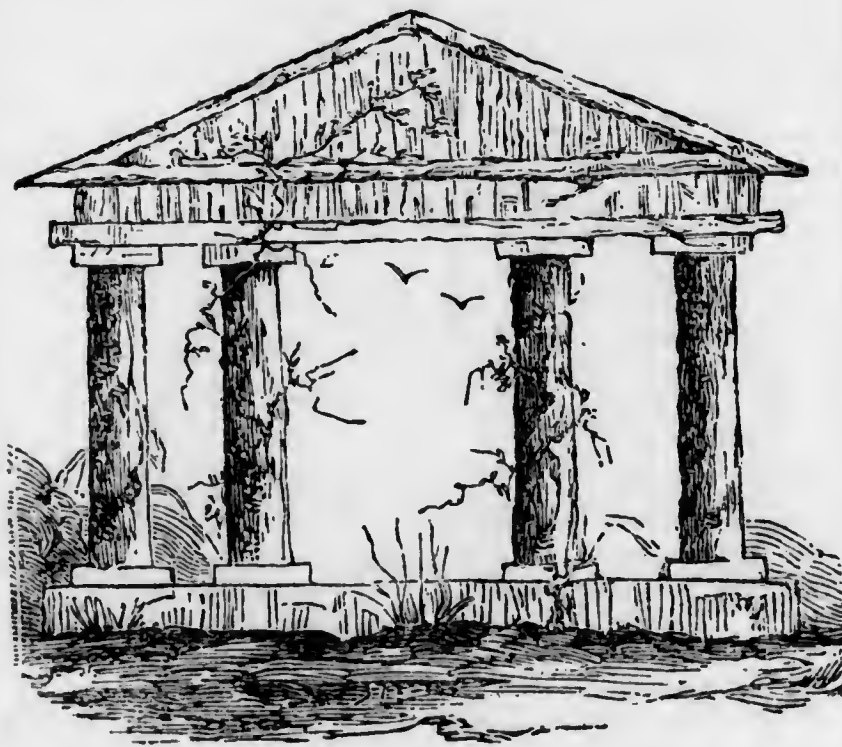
is a design for a summer-house in the Grecian style. The roof is formed of rough boards, and the gables or pediment and cornice are covered with bark. The roof is supported by pillars formed of the trunks of trees with the bark on. A house built in this way, embowered in shade and overgrown with ivy or creepers, produces a charming effect.
